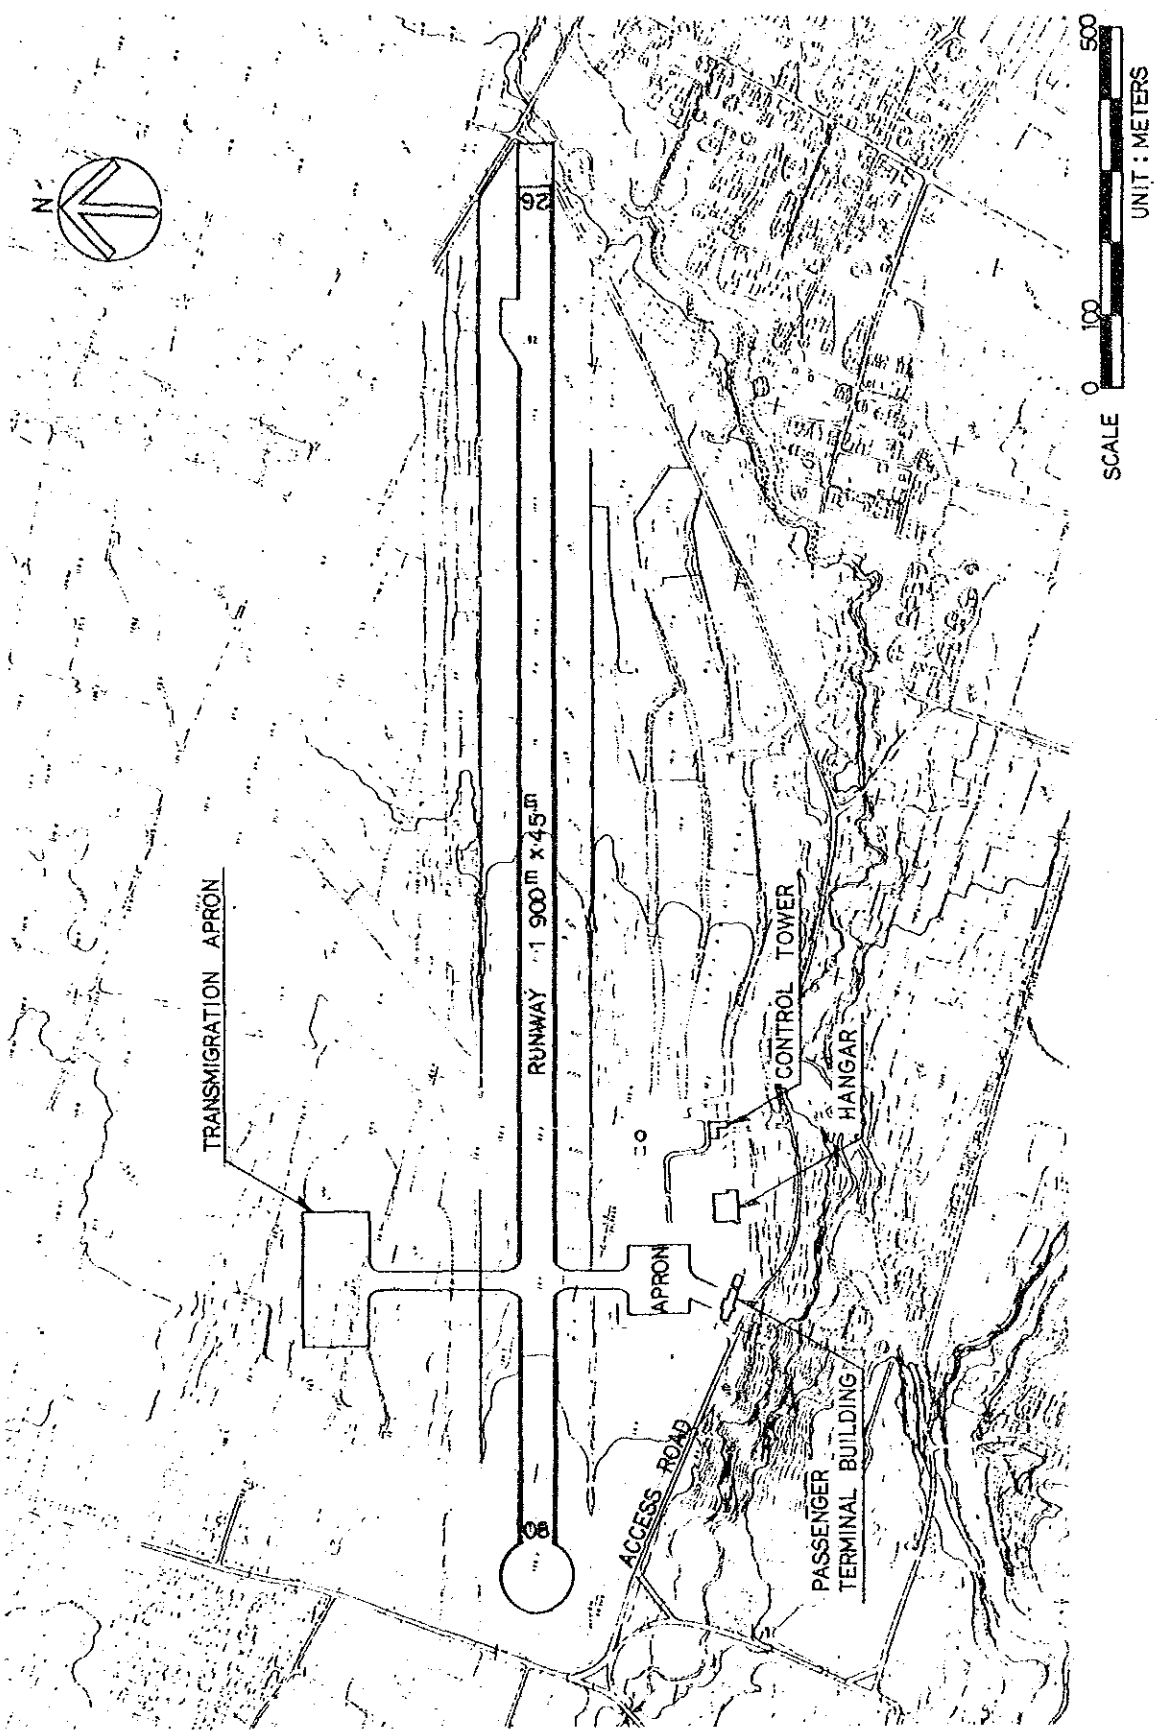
Layout Plan of the Existing Surakarta Airport
